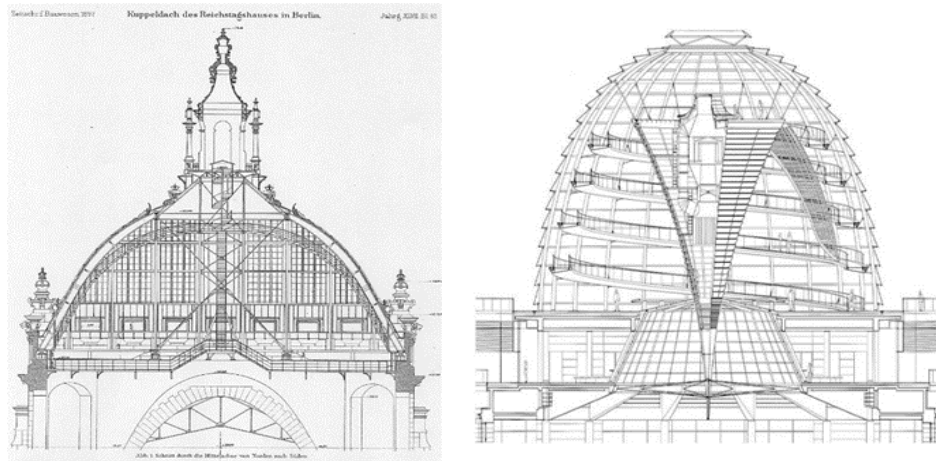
The original roof of the Berlin Parliament building and the added transparent dome [URL-4]
